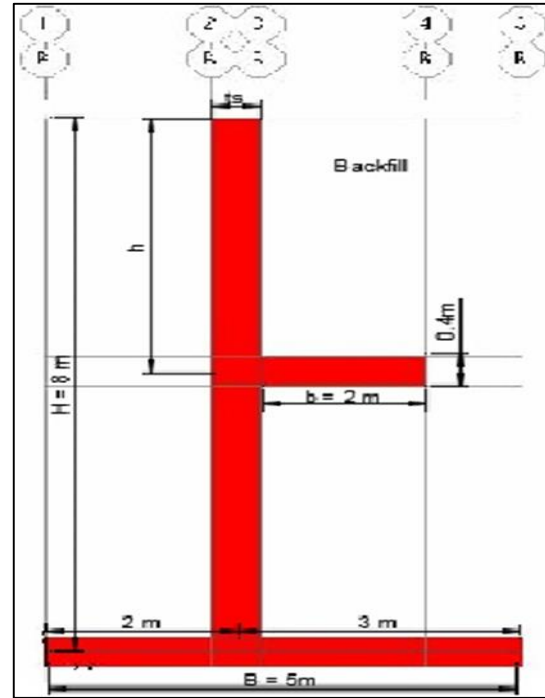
Dimensions of Cantilever retaining wall with shelf
